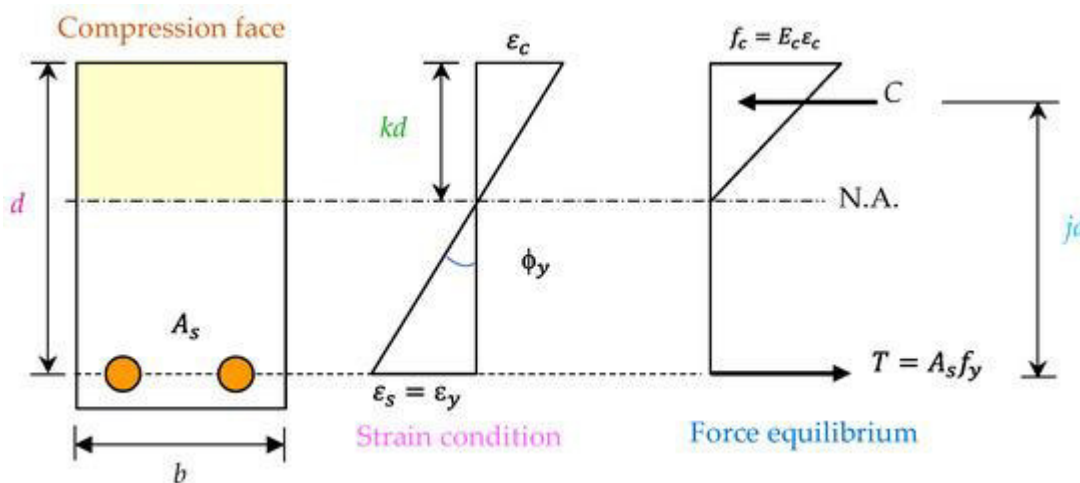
The stress and strain profiles of a typical reinforced concrete beam at the yielding state.
